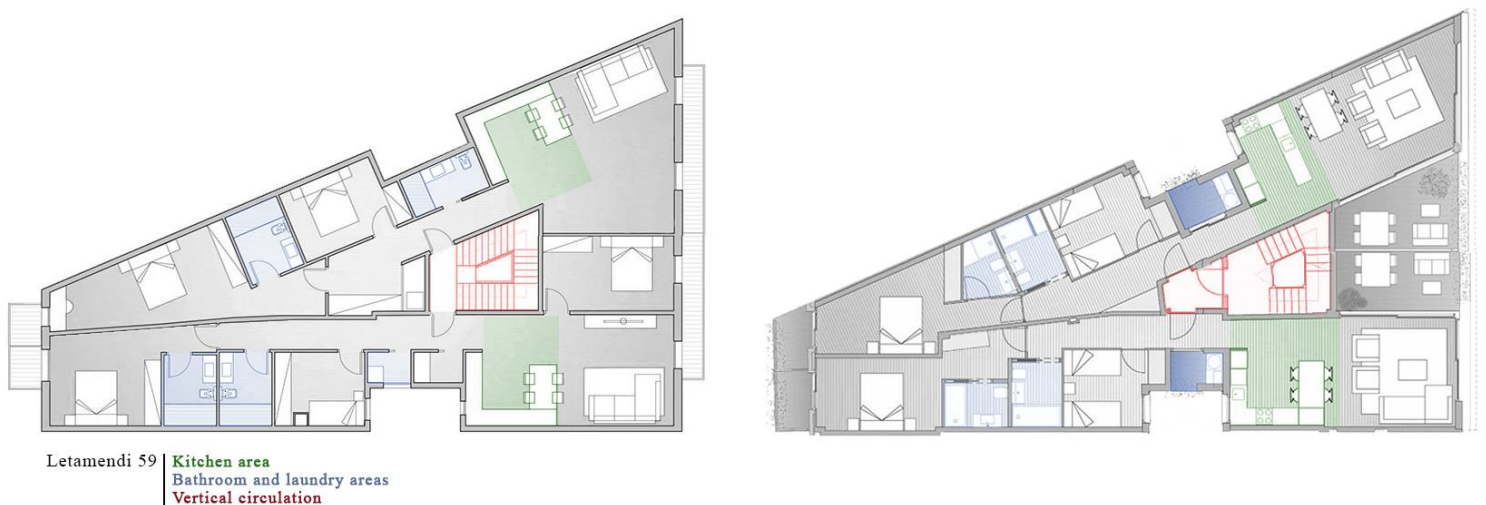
Left: Existent apartment layout. Right: Proposed layout for Letamendi 29's rooftop expansion. Note the similarities in the location of kitchen, bathroom, laundry, and vertical circulation areas. Adapted from Casa Ático (Dossier Letamendi 29, 2015)
